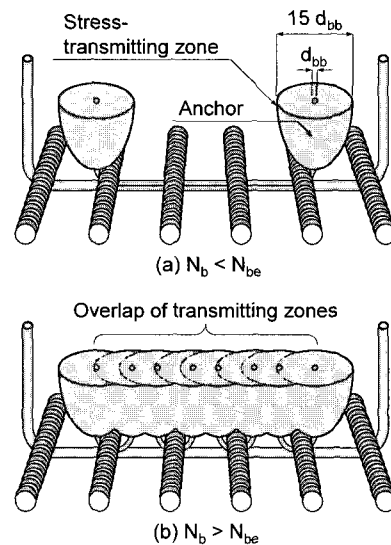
Stress – transmitting zones of concrete around anchors of bond-strengthening hooks
